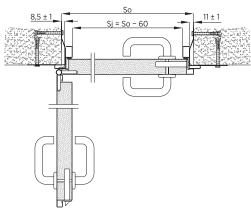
Installation of a single-leaf door with a corner frame – horizontal cross-section
